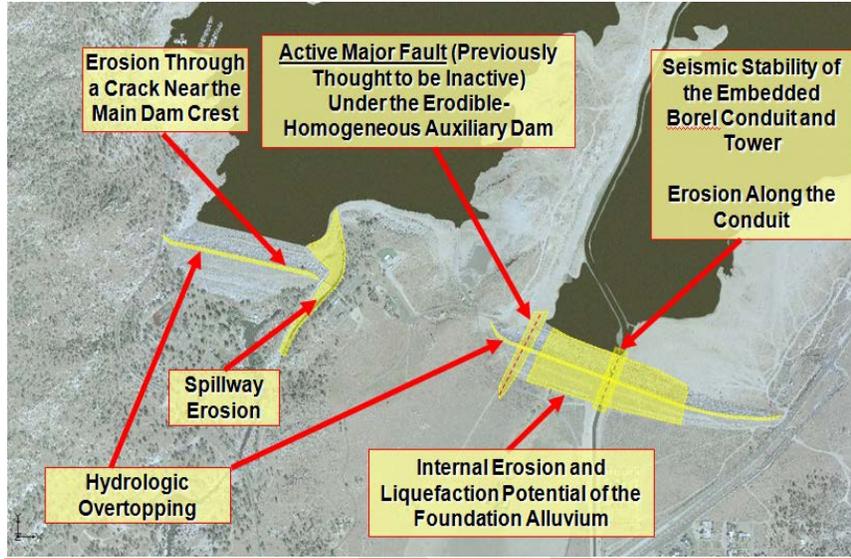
Significant Potential Failure Modes at Isabella Dam (DSAC1)
